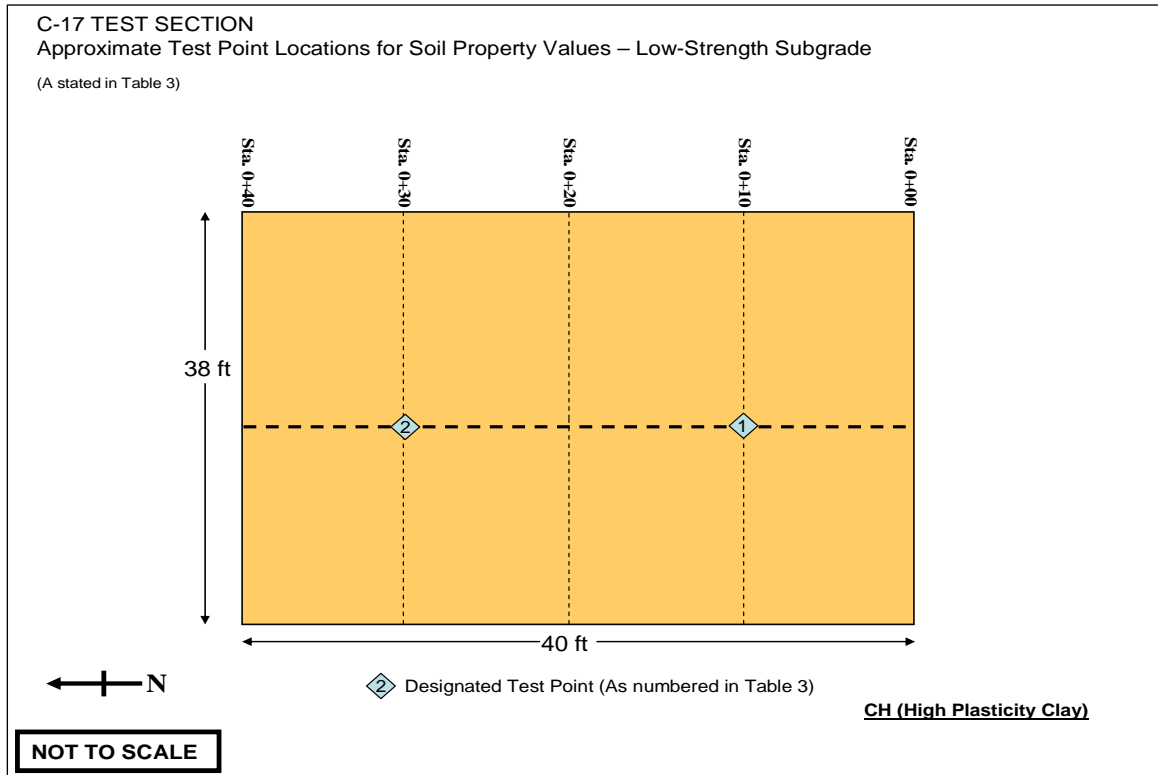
Test Point Locations and Test Section Layout – Low-Strength Test Section
